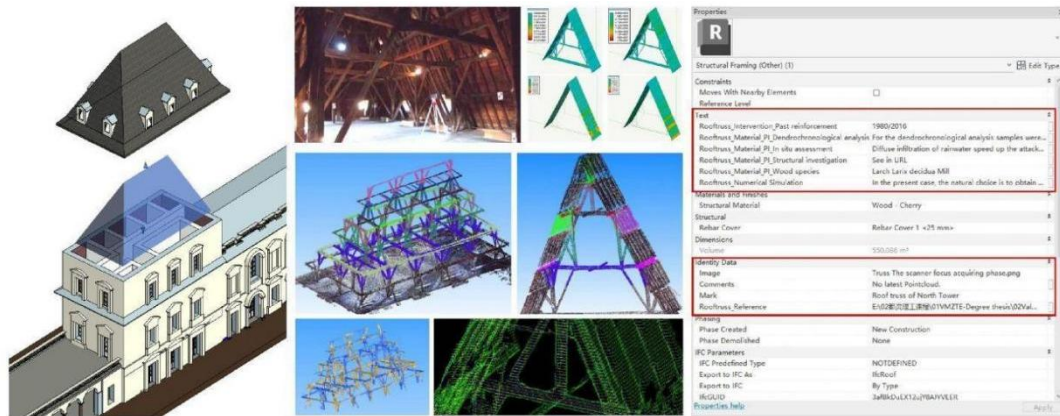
(Left) Simplified roof trusses model using In-place component (Middle) Information and data from previous studies²⁴(Right)Parameters in Revit
